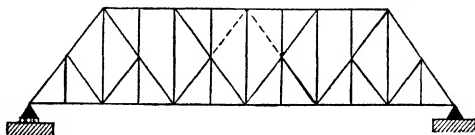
Subdivided Pratt truss commonly known as the Baltimore truss.
